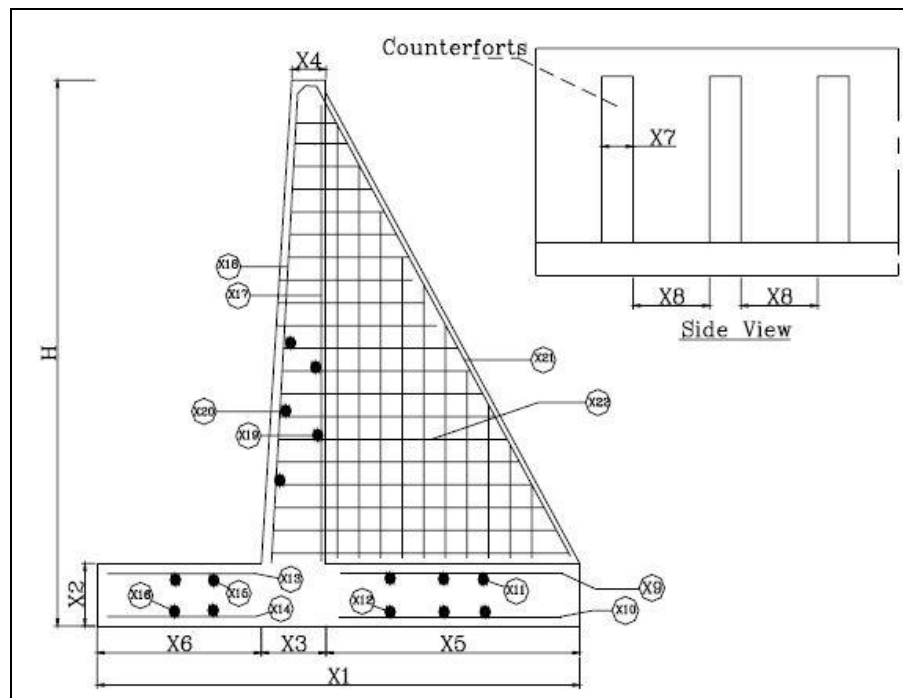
Design variable for typical reinforced concrete counterfort retaining walls
